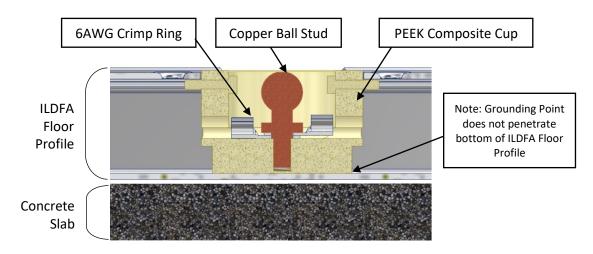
Cross section view of ILDFA grounding point embedded in profile
